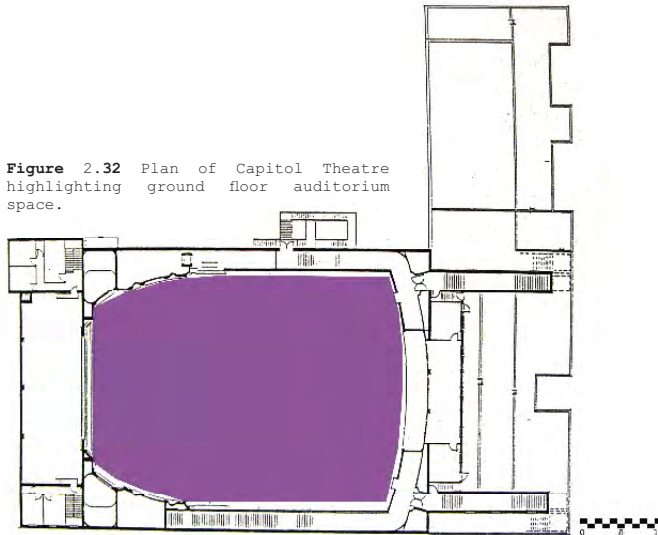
Plan of Capitol Theatre highlighting ground floor auditorium space.
